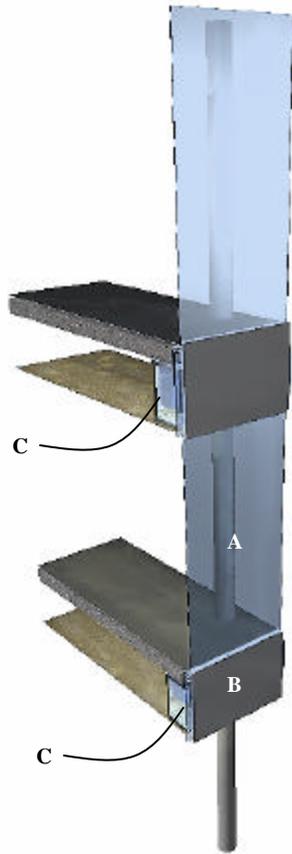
Section of curtainwall with integral perimeter wall escape mechanism.
